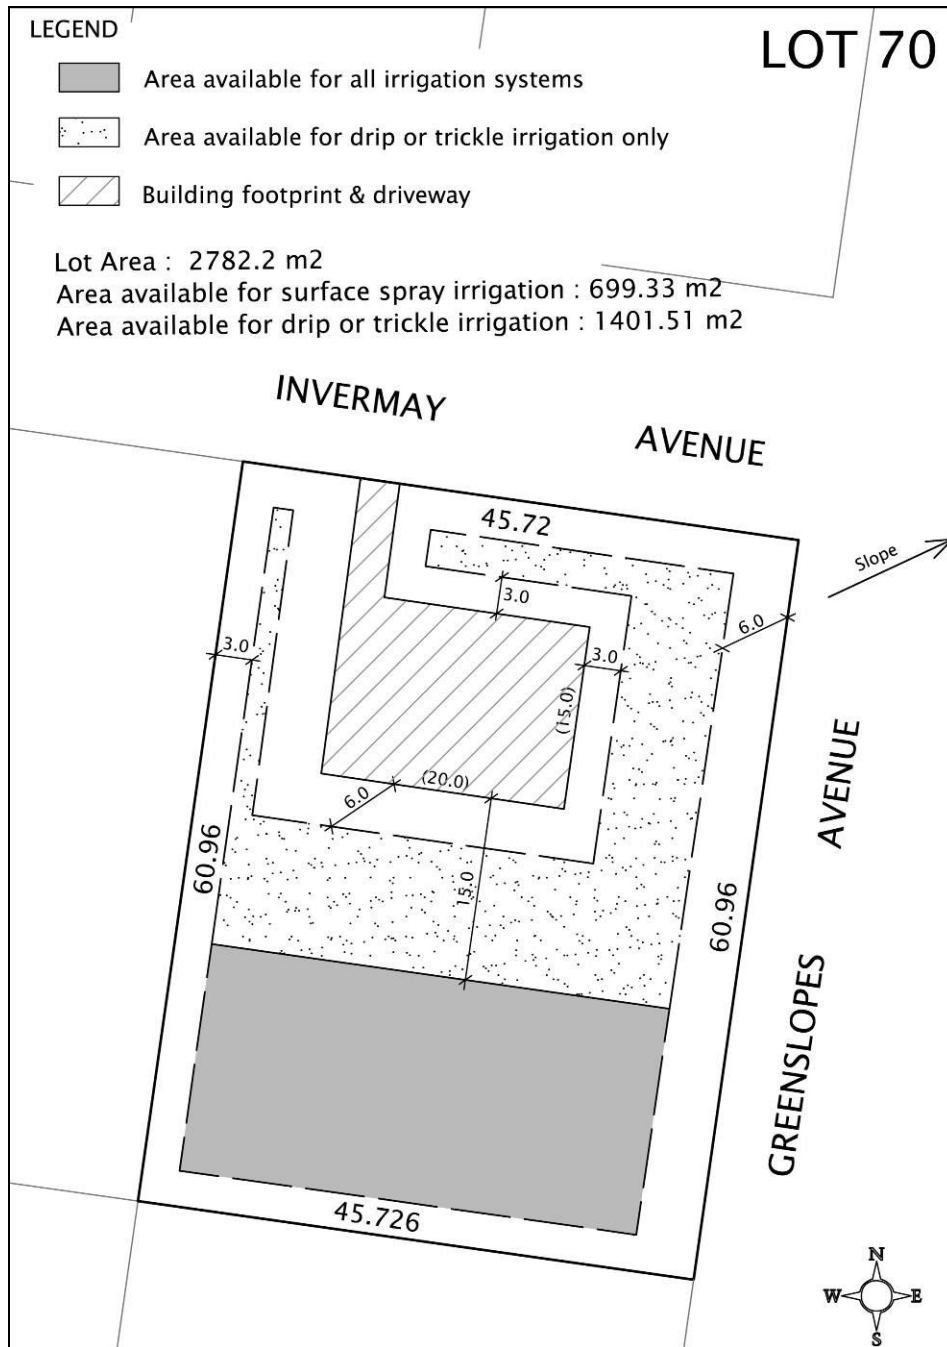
Sample site plan showing building envelope, driveway & effluent disposal area
